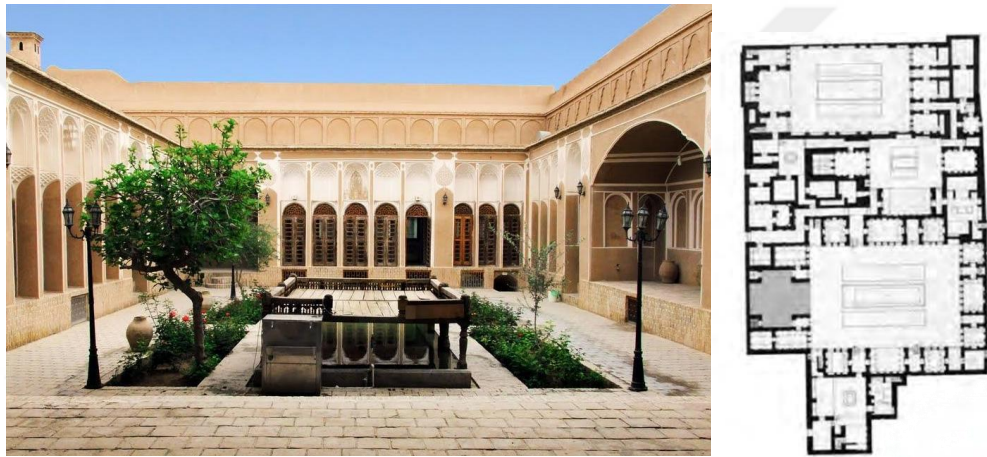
Picture and plan of Yazd courtyard house example - Mahmoudi house (Source: Mahmoudi Zarandi, 2016)
